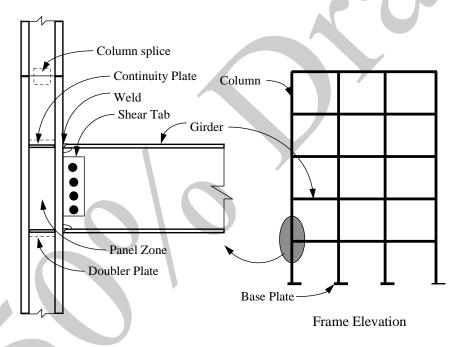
Elements of Welded Steel Moment Frame
